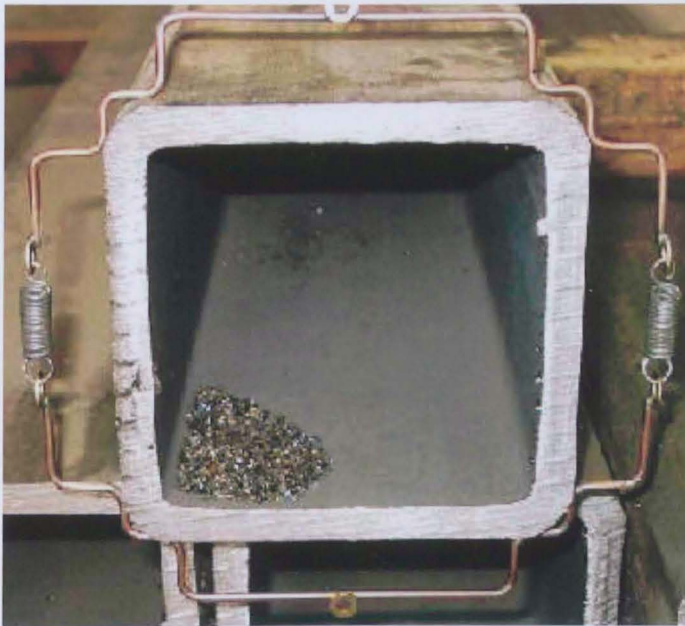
Spring grip frame, the “thing”, for LVDT connections
